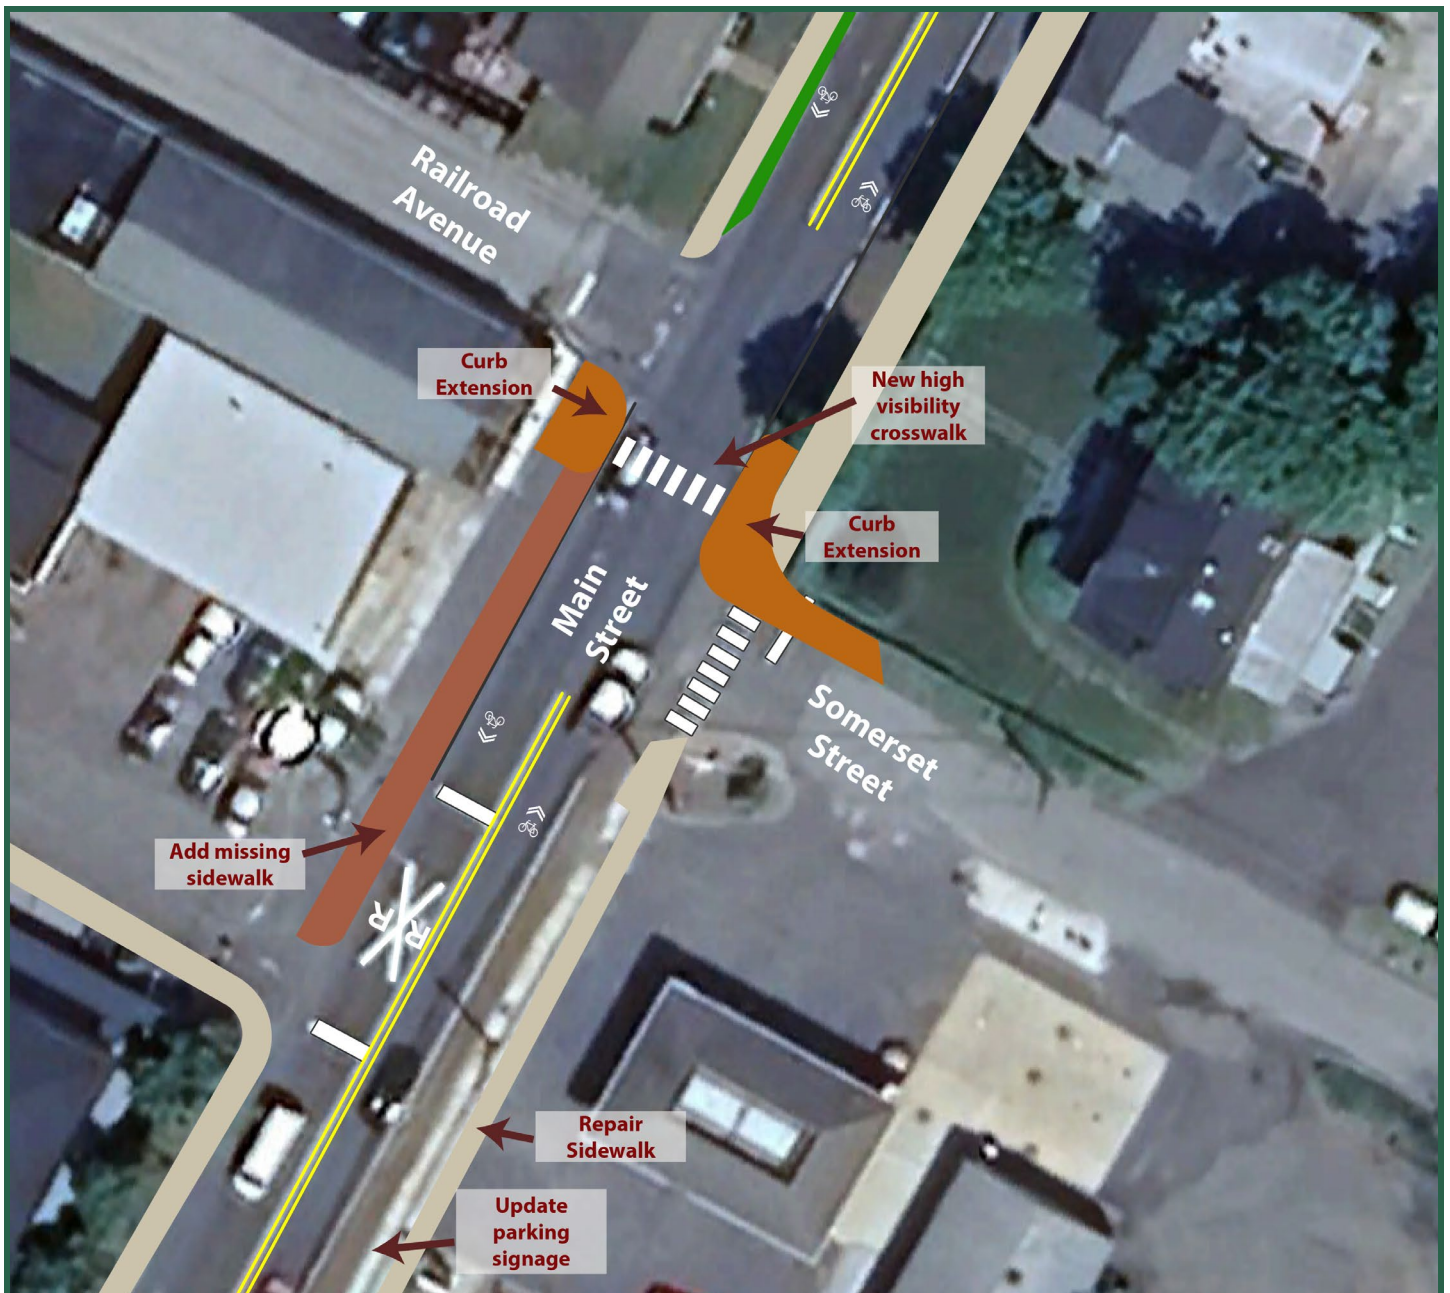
Railroad Crossing to Railroad Avenue Recommendations.
